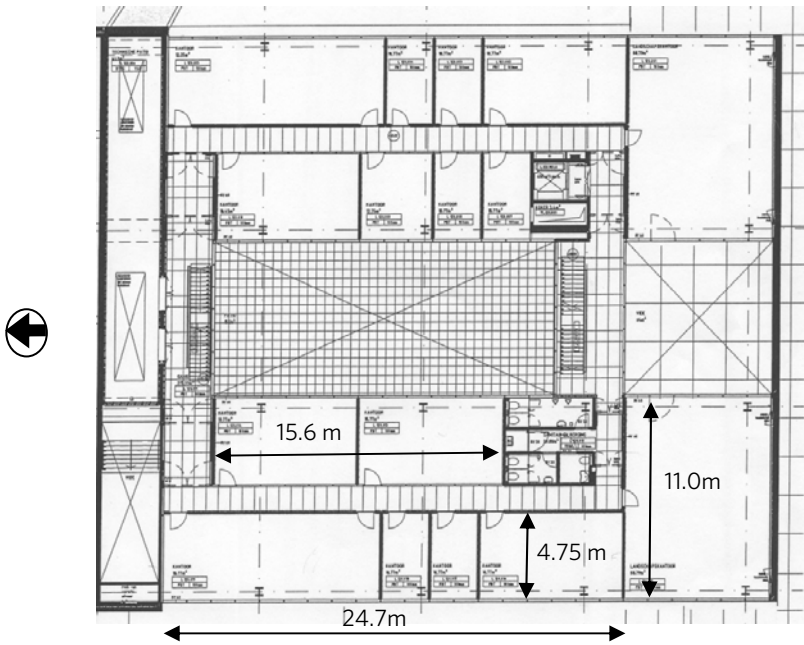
Floor plan of the new office buildings “Sint-Pietersnieuwstraat” (Ghent University)
